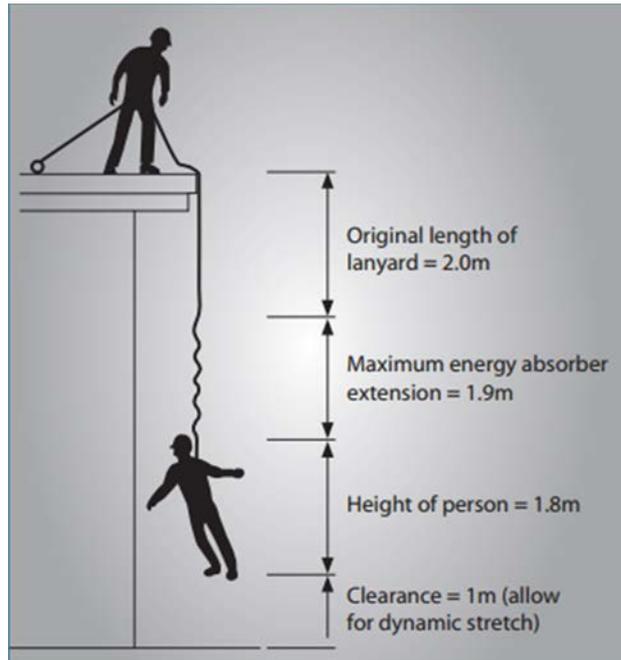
Example of considerations when assessing suitability of fall arrest equipment
